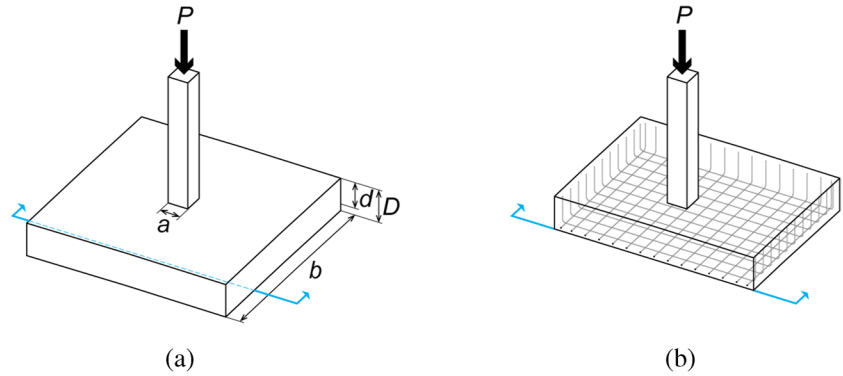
(a) Dimensions of spread footing, and (b) section of spread footing
